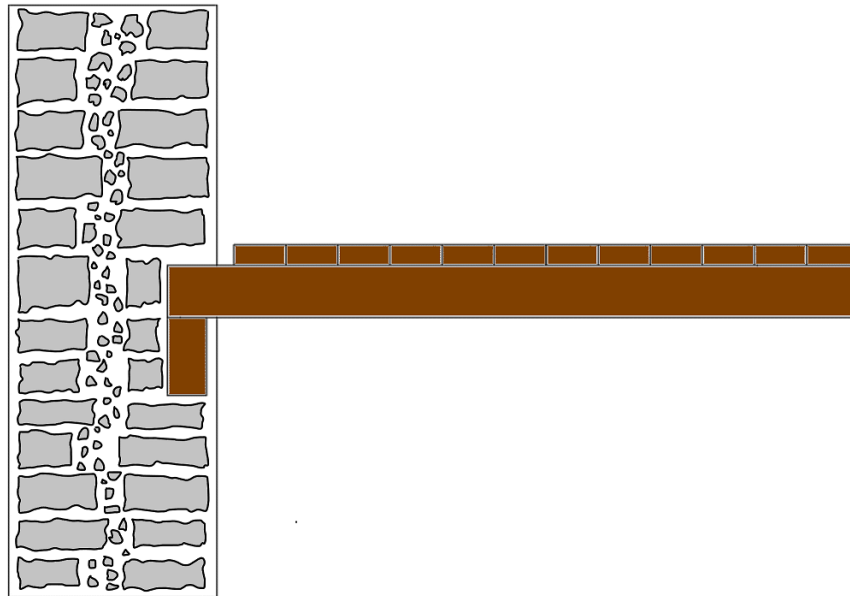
Connection detailing where the beams are laid on the collector beam.
